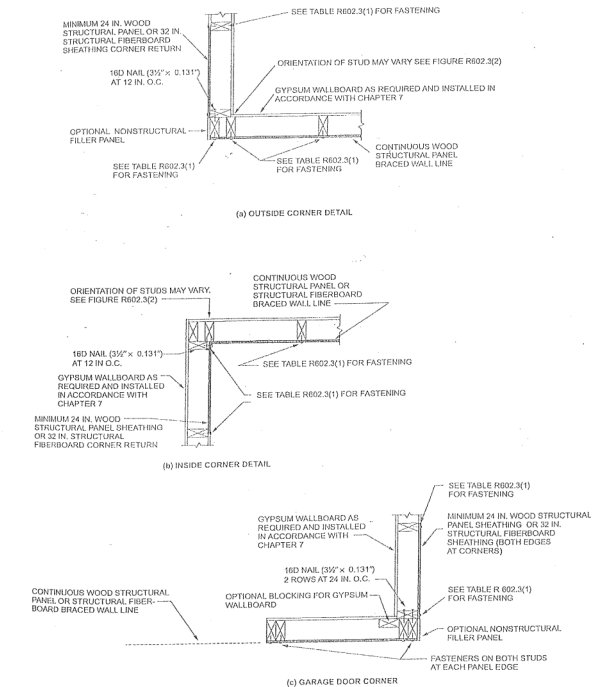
(1) TYPICAL EXTERIOR CORNER FRAMING FOR CONTINUOUS SHEATHING
